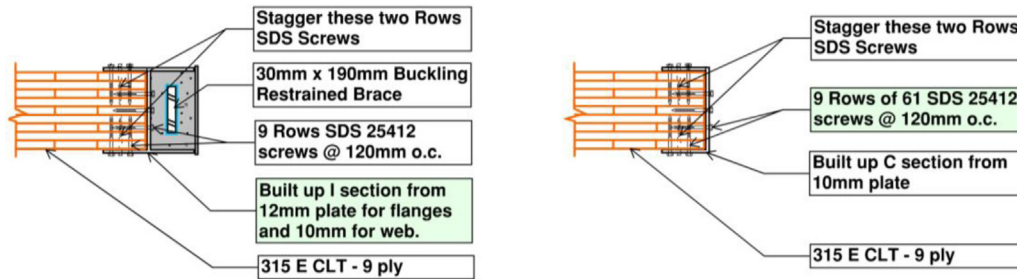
Typical BRB connection detail (RJC Engineers, 2021) [22].
